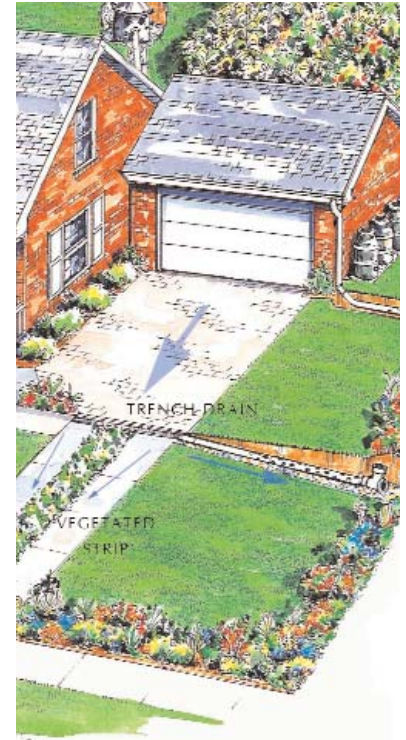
(above). Depiction shows application of trench drain in driveway, and vegetated driveway strip.
